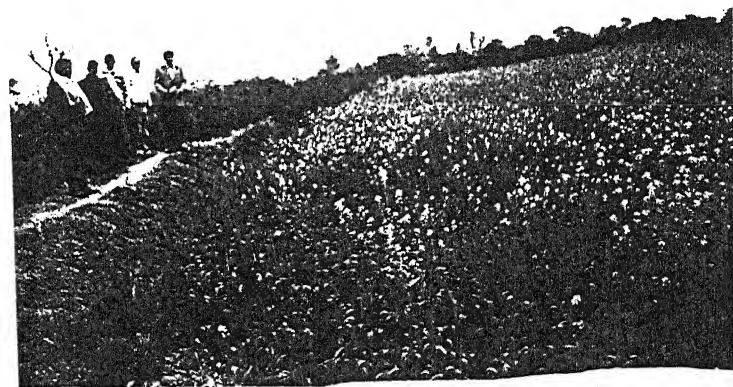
CB of Janwa village, length 158 metres, constructed from Work Fund
